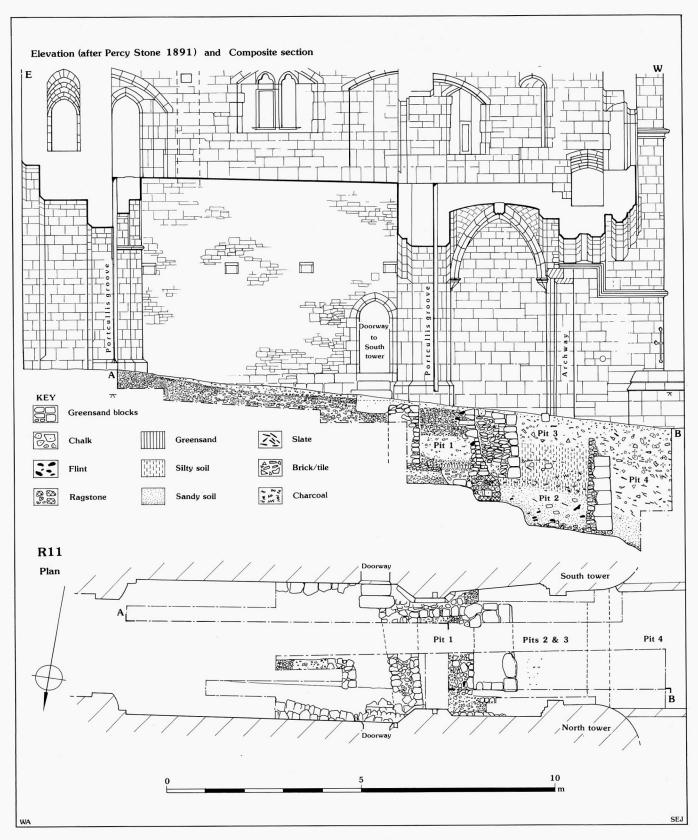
Elevation of the south wall of the gatehouse and plan of R11
